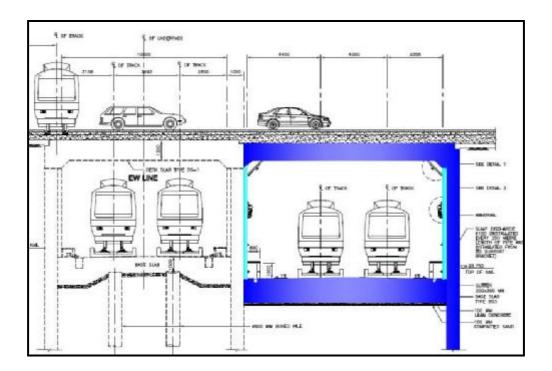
Underground Railway Structure at Nakhonchaisri Intersection
